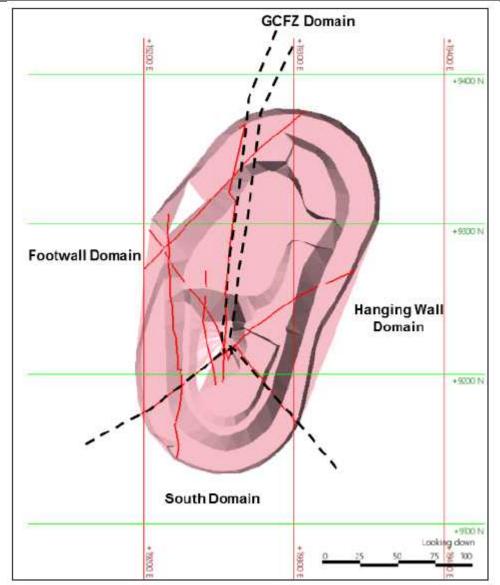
Plan view of existing pit showing the geotechnical domains used for rock mass characterisation 16.2 Underground Design Considerations
